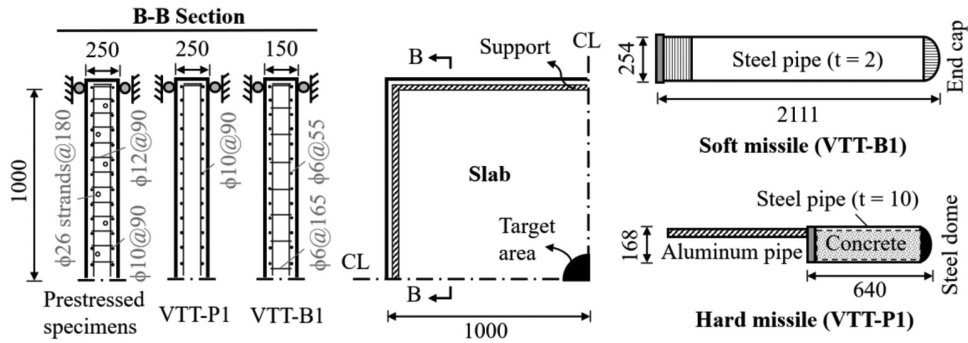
Missile and target details of impact tests. (Note: Dimensions in mm; 1 mm = 0.0394 in.)
